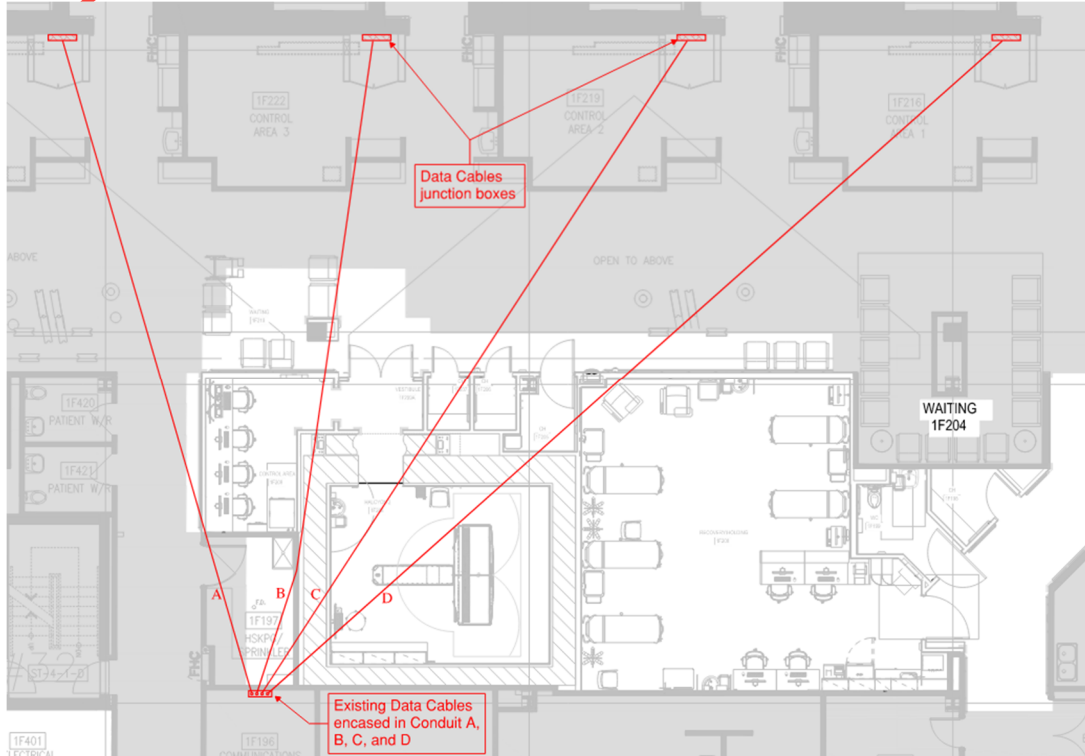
Existing Underground Conduit Run to Bunkers 1, 2, 3 and 4
